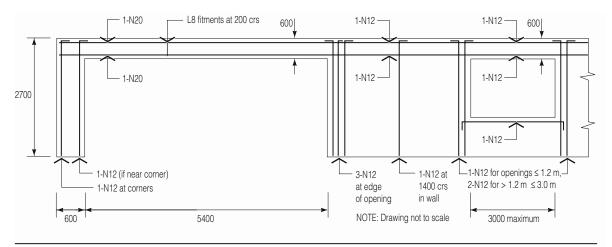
Wall Reinforcement for 140-mm Leaf for Wind Classifications N4 and C1 and 2700-mm Wall Height
